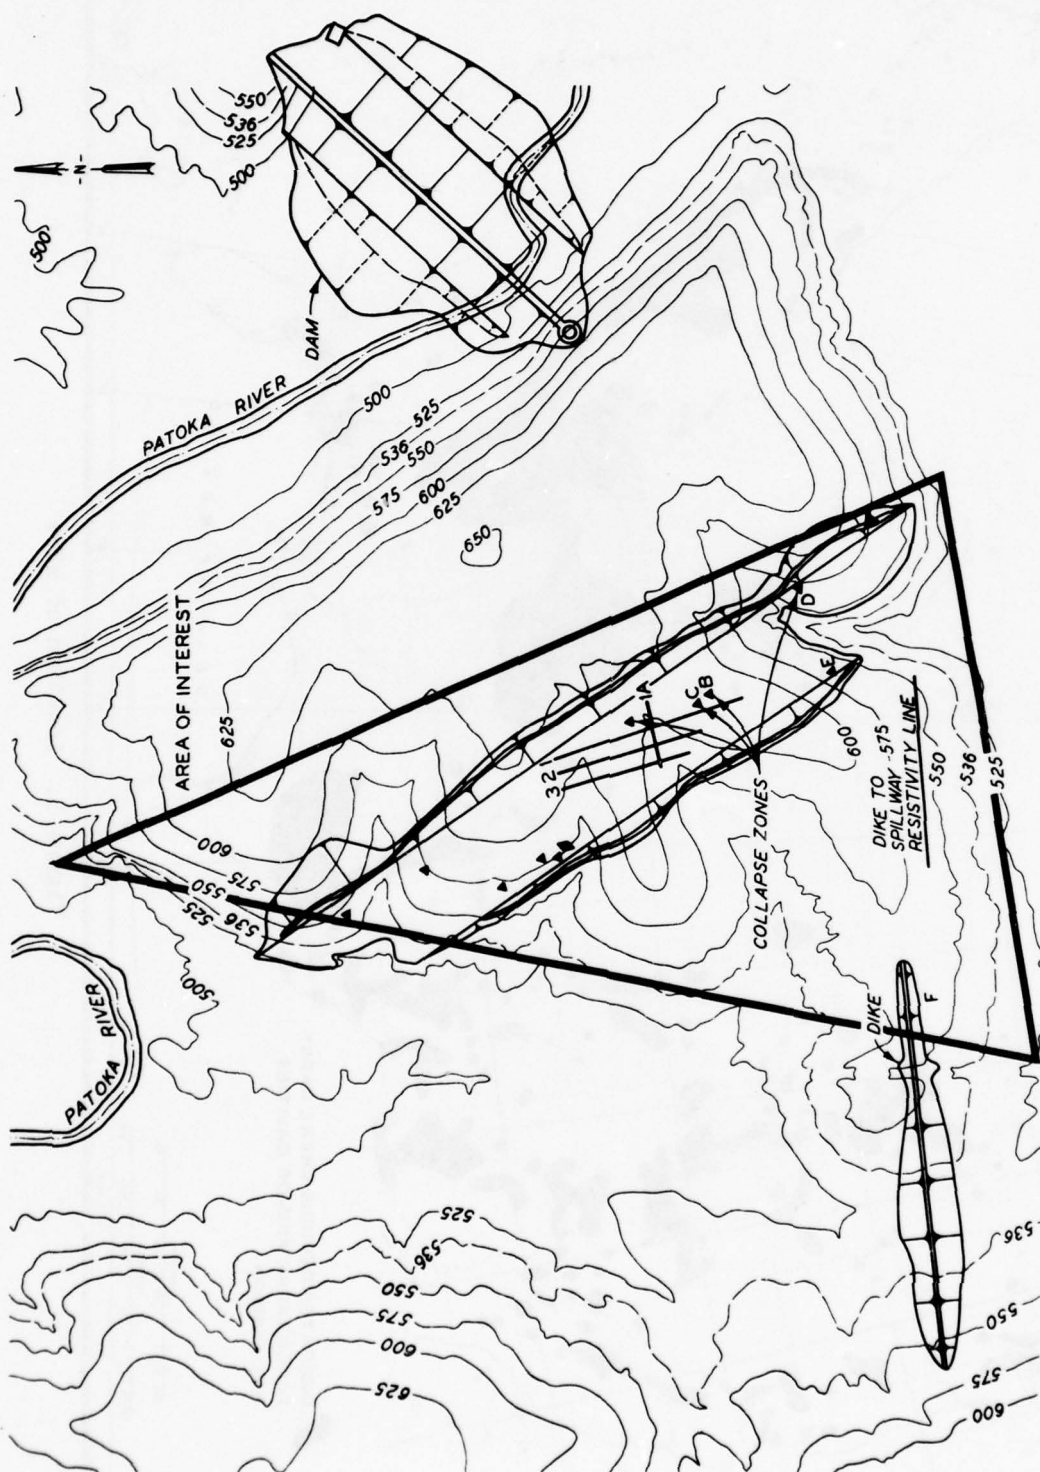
General plan of dam, spillway, and dike, Patoka Dam site, Indiana
